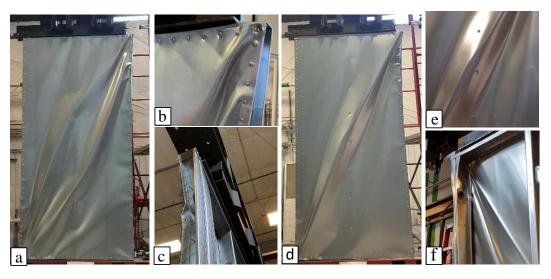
Failure phenomenon of Group 1 shear walls, (a) Sheet buckling at about peak point; (b) Sheet tearing; (c) Buckling on boundary studs; (d) Sheet buckling of SW-N-M2 and screws pulling-over; (e) Screws pulling-over; (f) Buckling on boundary studs of SW-N-M2
